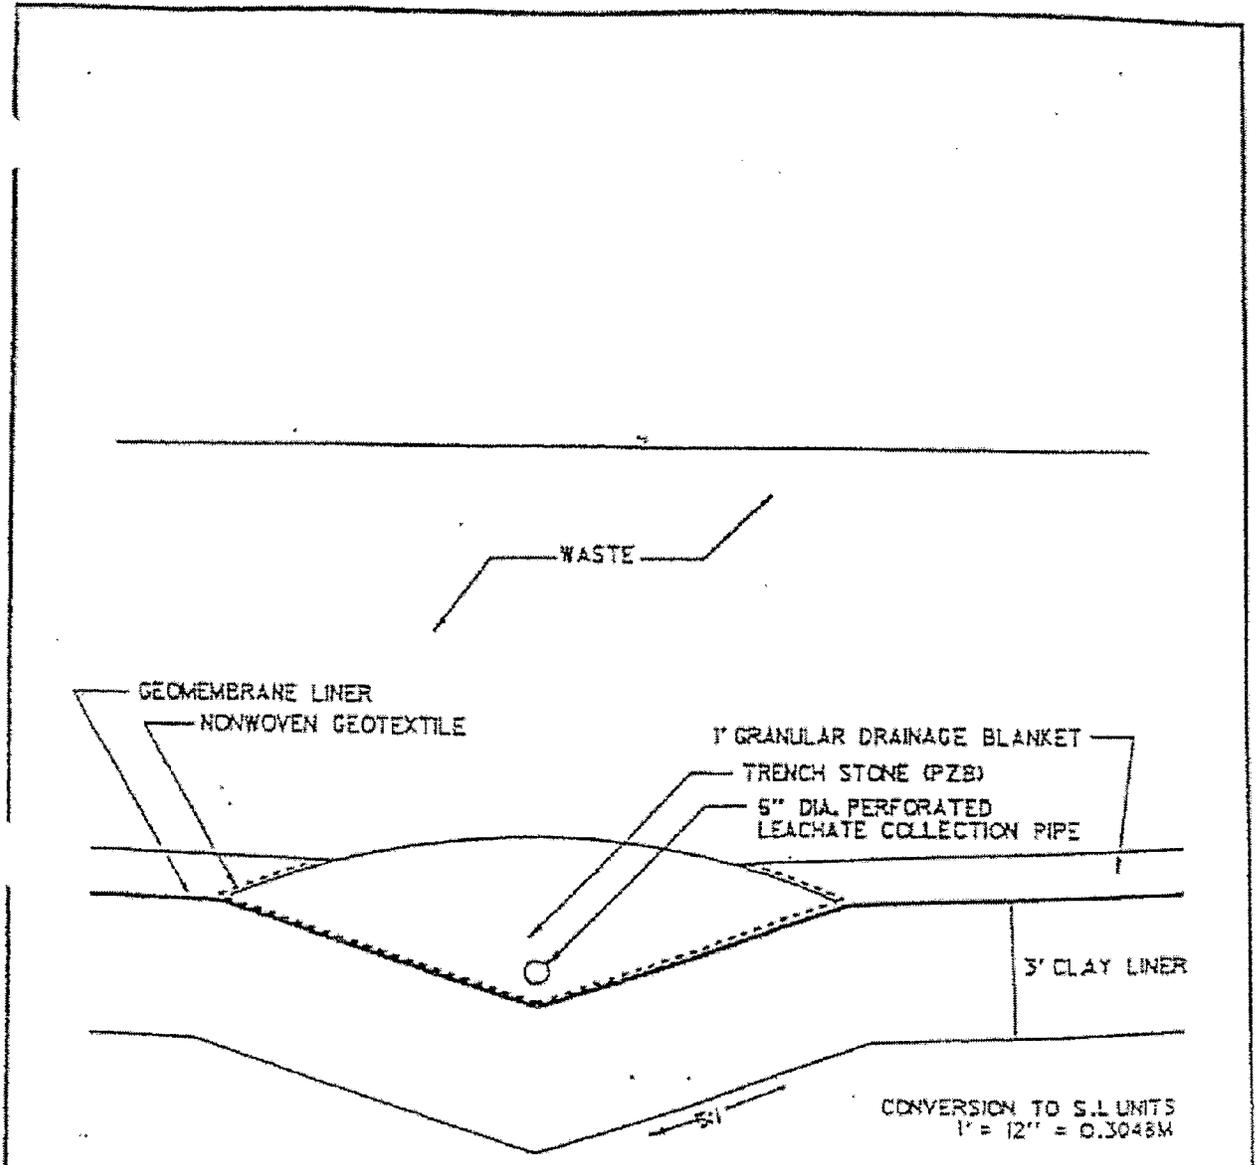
TYPICAL V-SHAPED TRENCH FOR LANDFILLS WITH COMPOSITE LINERS
